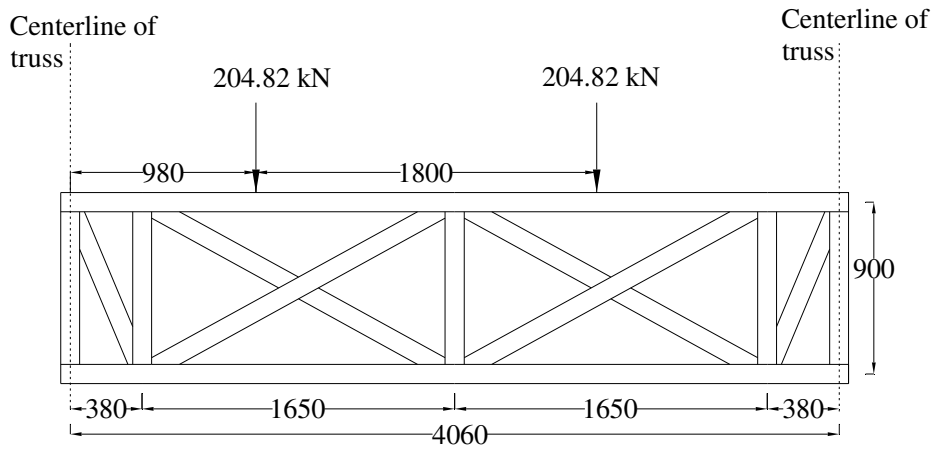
Factored tandem load on floor beam at closest position to left truss
